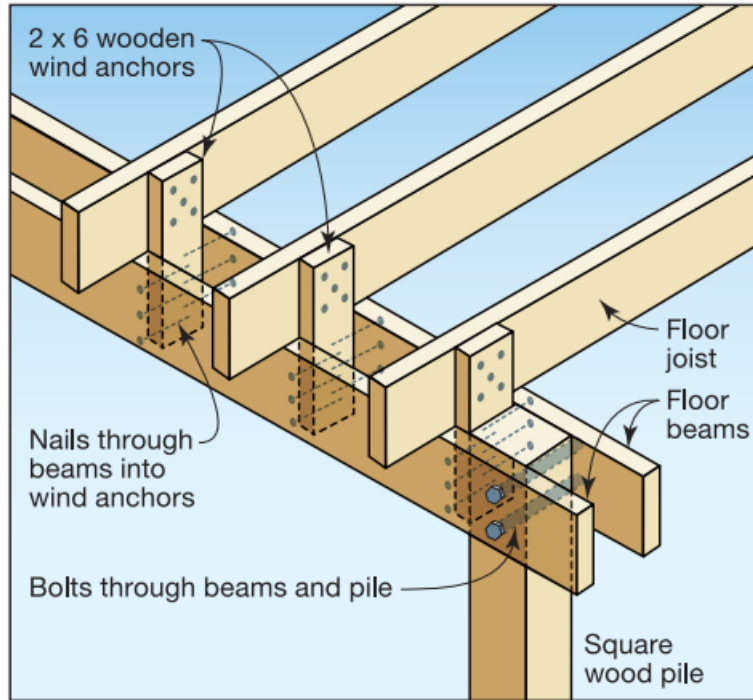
Wooden wind anchors used to connect floor joists to floor beams
